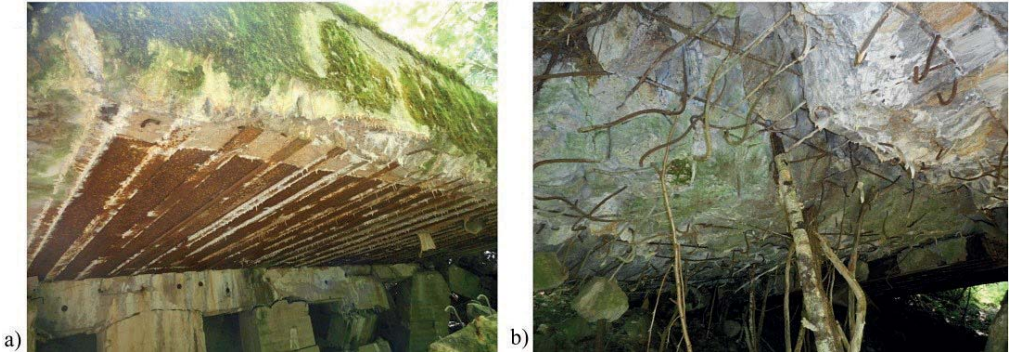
a) View of a thick slab on steel beams b) and dense steel reinforcement (own photos)
